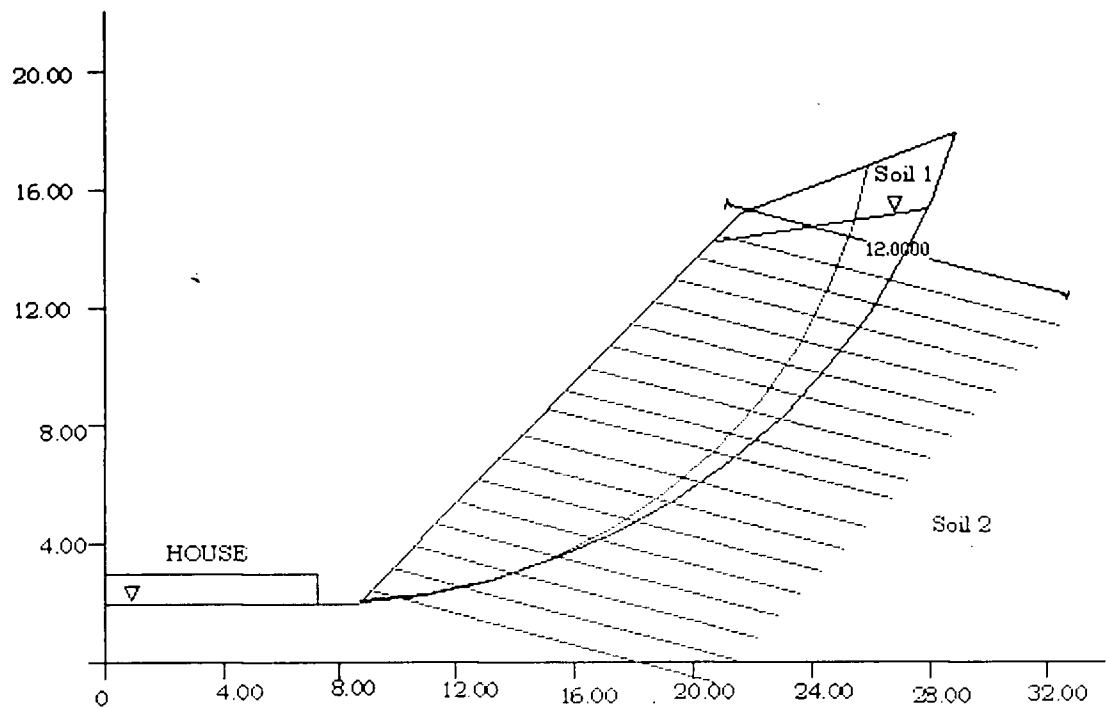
Proposed nail arrangement and the failure surfaces considered for cut slope 2
